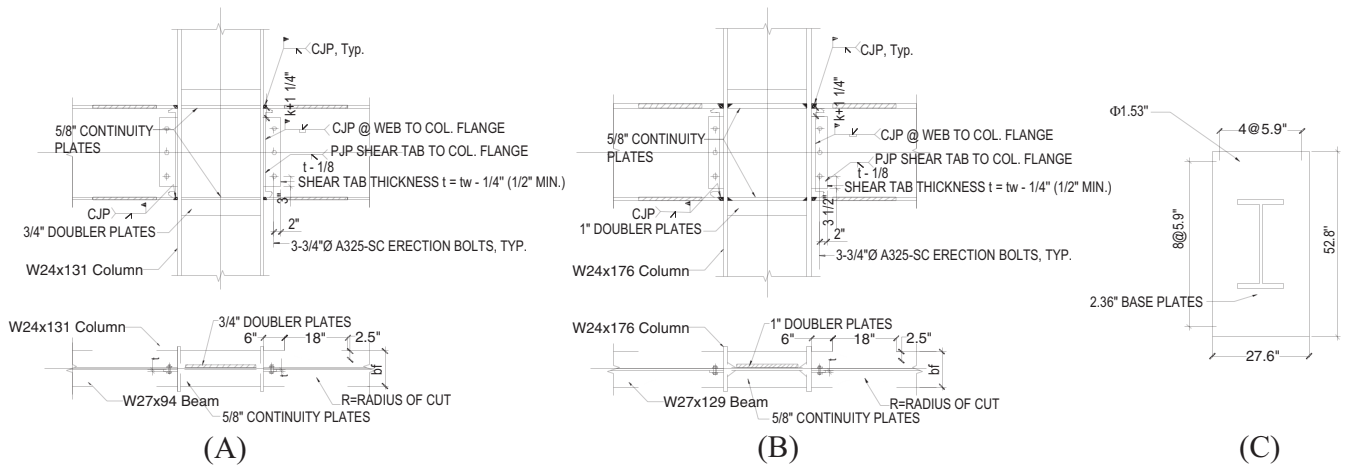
| Connection details: (A) Beam-to-column for archetype A, (B) beam-to-column for archetype B, and (C) base plate for both archetypes.
